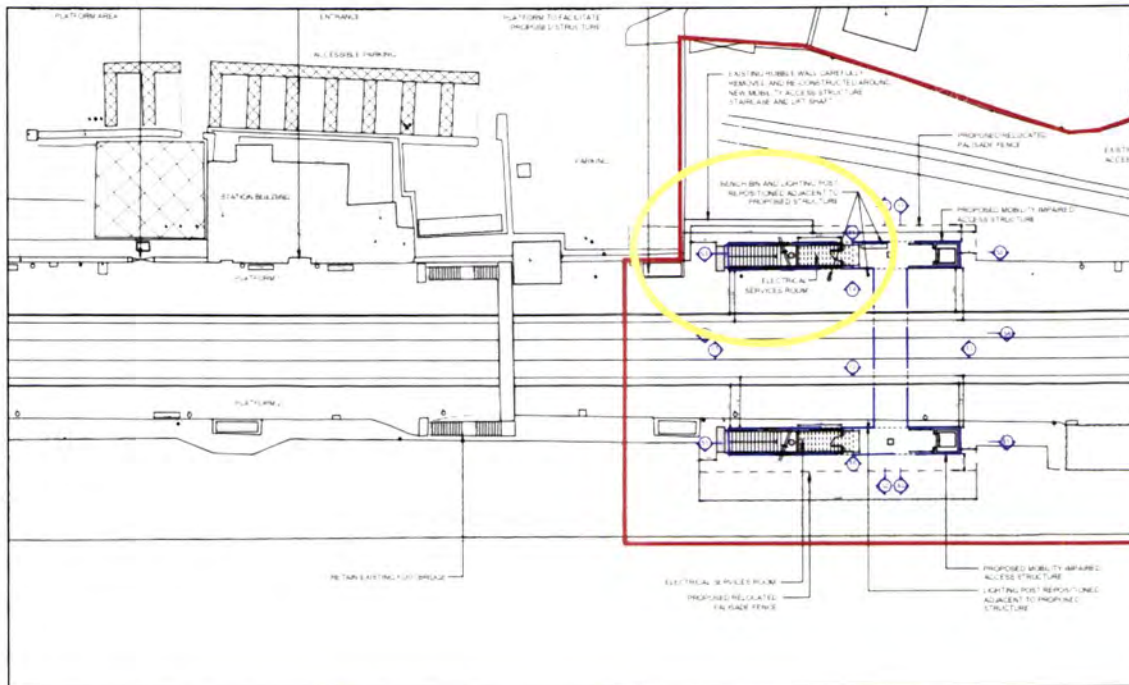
Proposed plan showing small section of masonry (circled in yellow) wall to be removed to accommodate accessibility structure.
